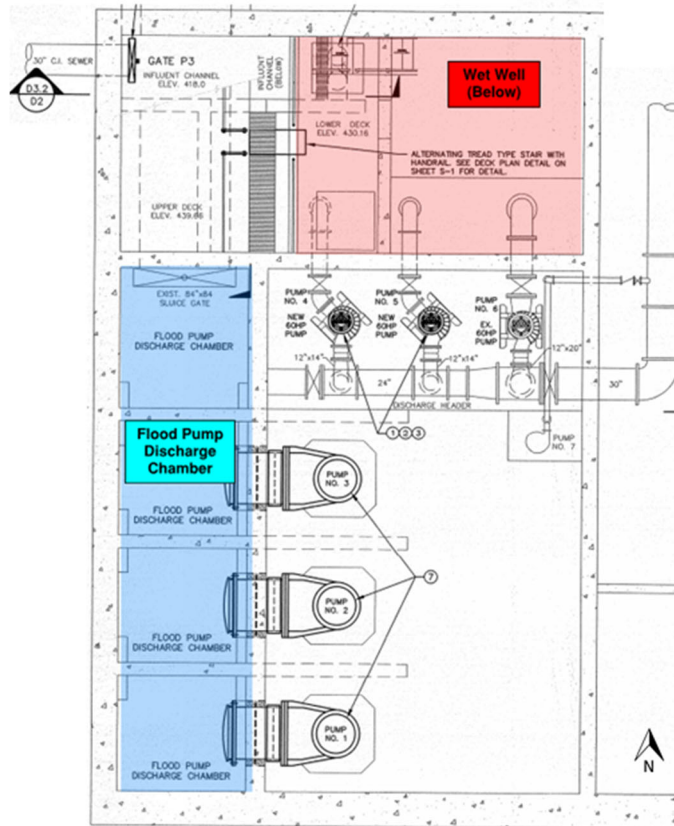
Pump Station 8 Site Layout (Adapted from 2016 Record Plans)
